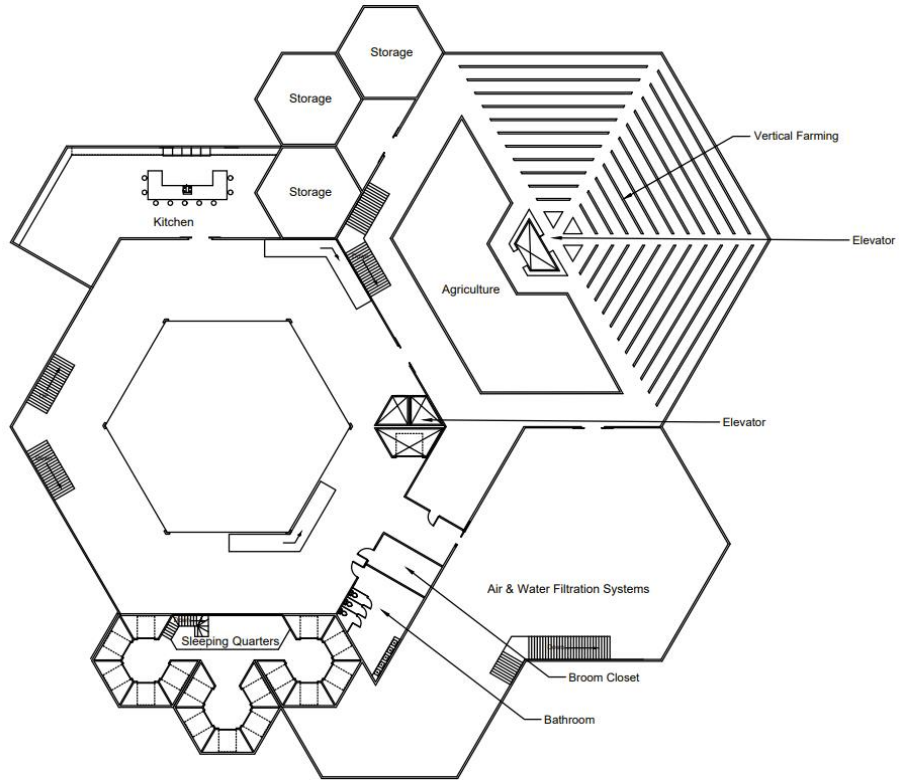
Floor plan of the B1 level of the lunar base (underground).
